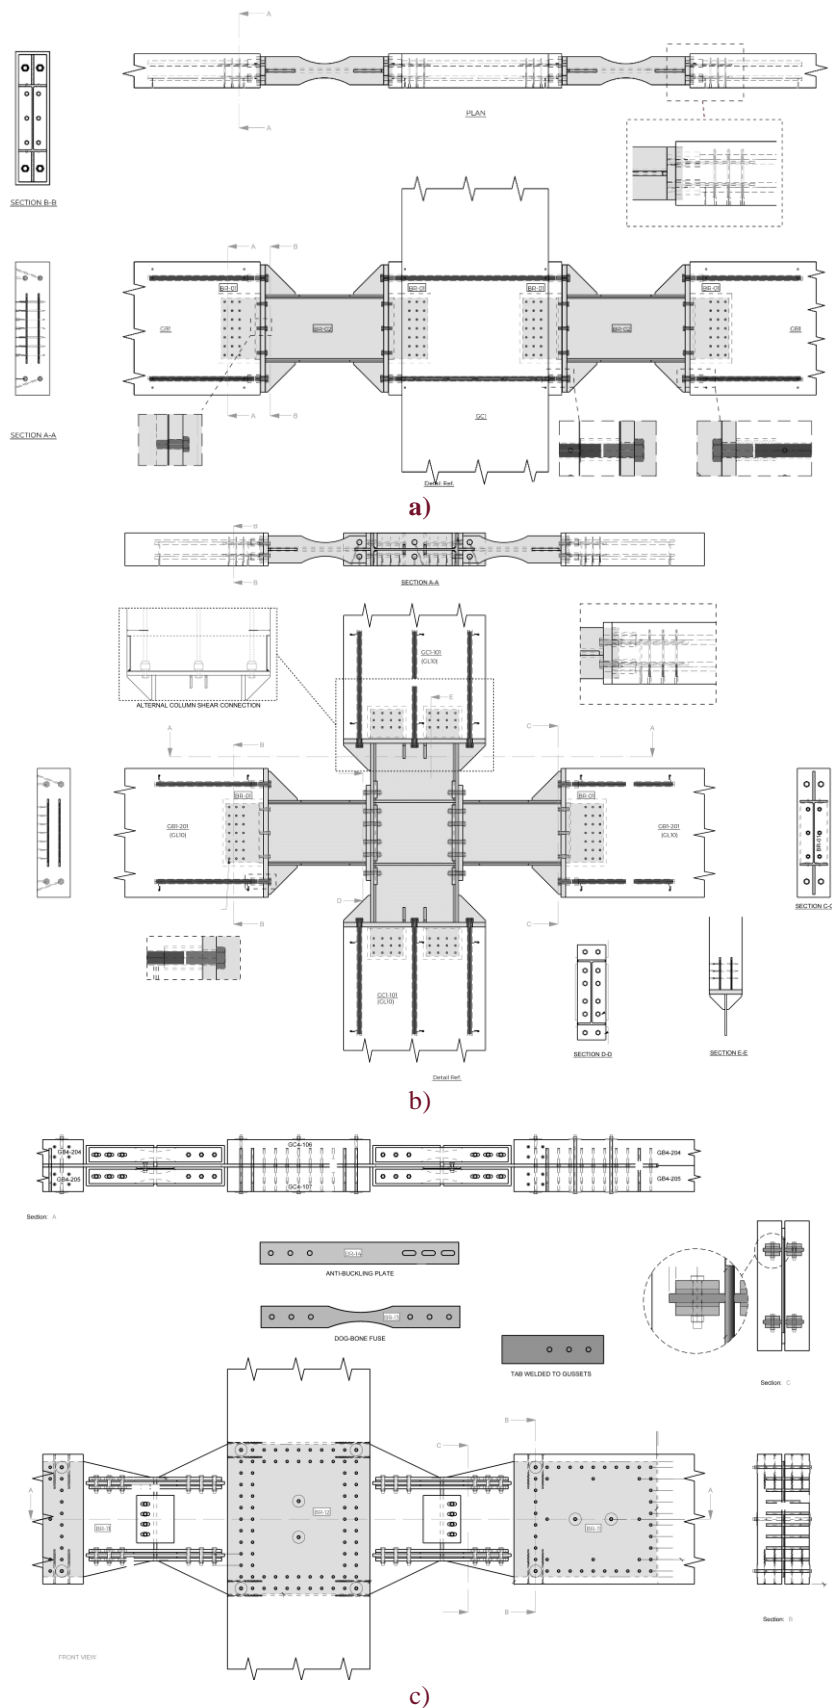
Red Stag Timberlab shop drawing models for three types of internal beam-column joint details tested (under Project Skyscraper): a) Continuous Column, b) Spliced Column, c) Fish-Tail
